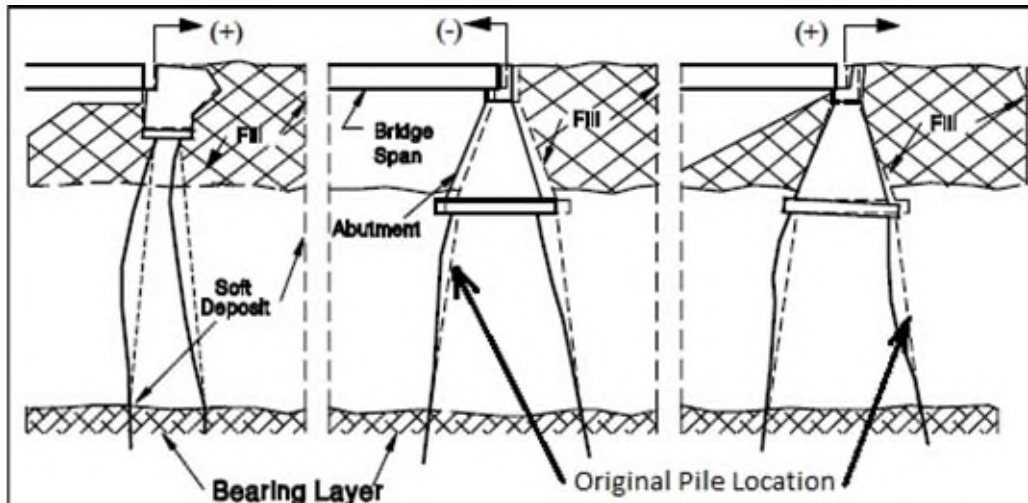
Examples of Abutment Tilting Due to Lateral Squeeze (FHWA, 2006a)
